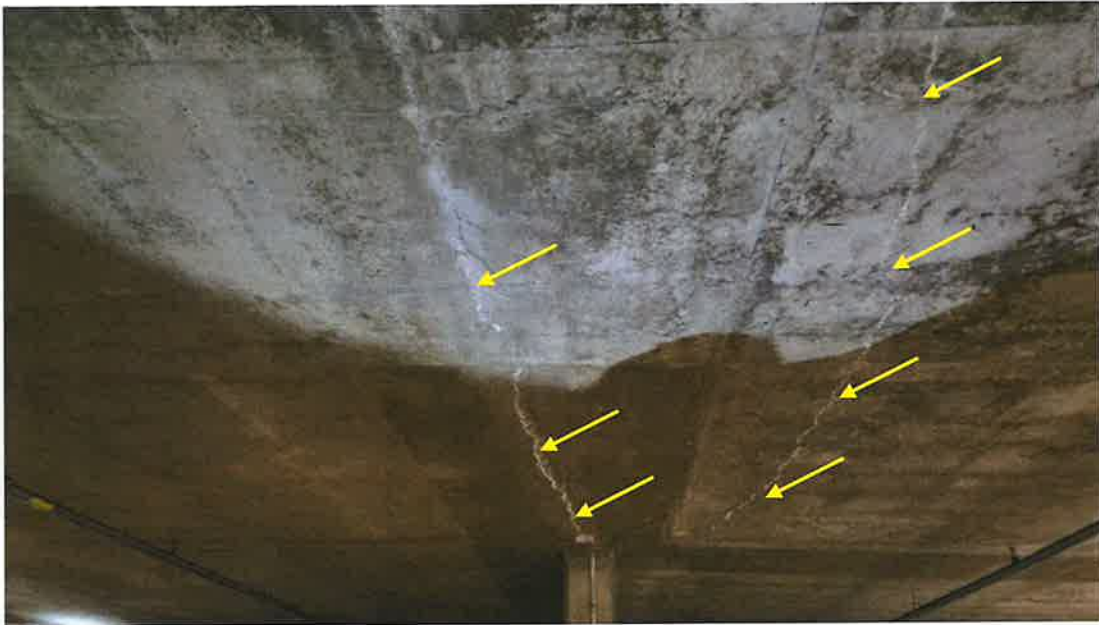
Typical Shrinkage Cracks at Underside of 1st Level. Note Efflorescence Emanating from Cracks
